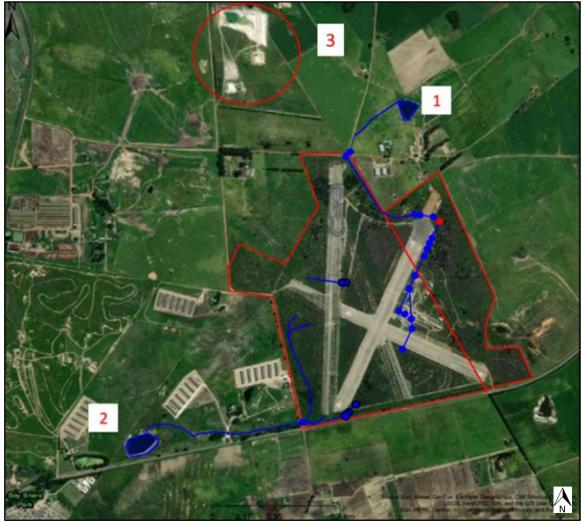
Existing stormwater drainage layout (Zutari, Engineering Services Report, Revision F)
